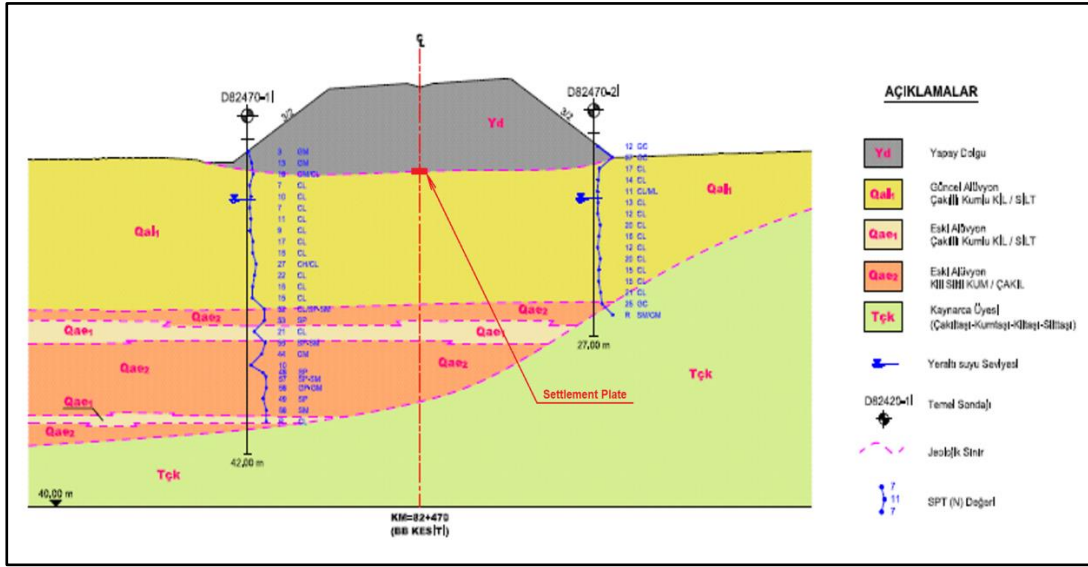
Embankment cross section and soil profile (Yuksel Project, 2010)
